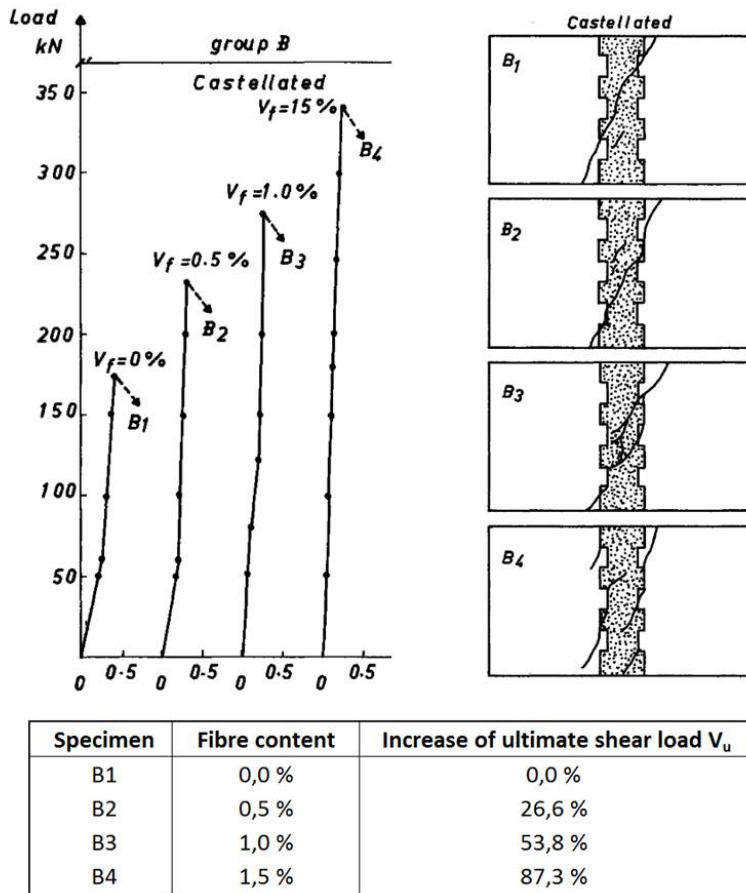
Castellated joint with fibre reinforced concrete as joint material by Abdul-Wahab (1992)
